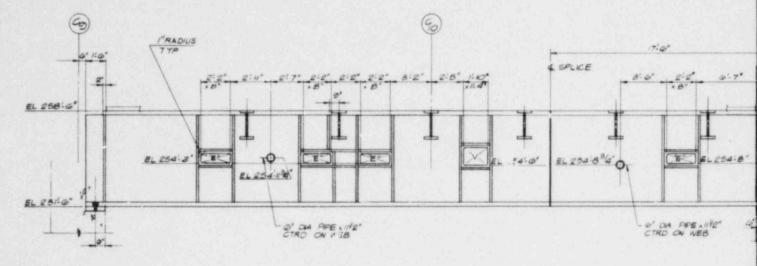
REPRESENTATIVE STRUCTURAL STEEL GIRDER DESIGN DETAILS (Sheet 1 of 3)
